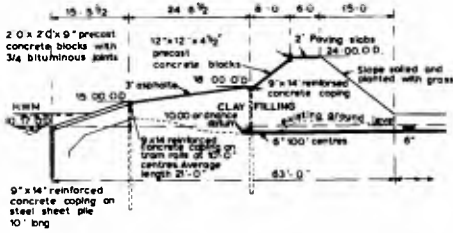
Pett Level Sea wall (Thorn, 1960)
